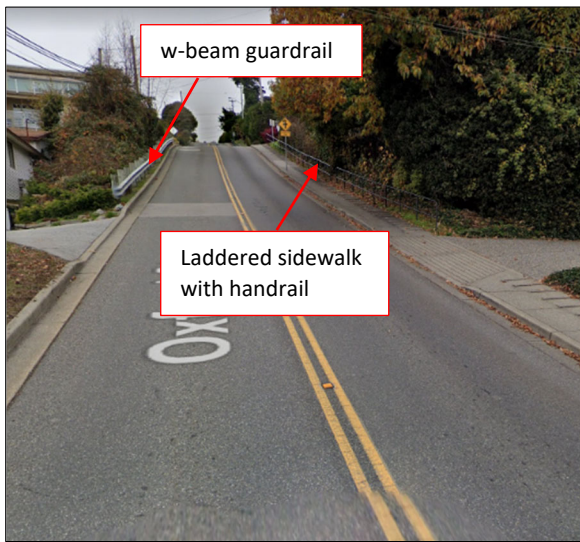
W-beam guardrail & laddered sidewalk c/w handrail
